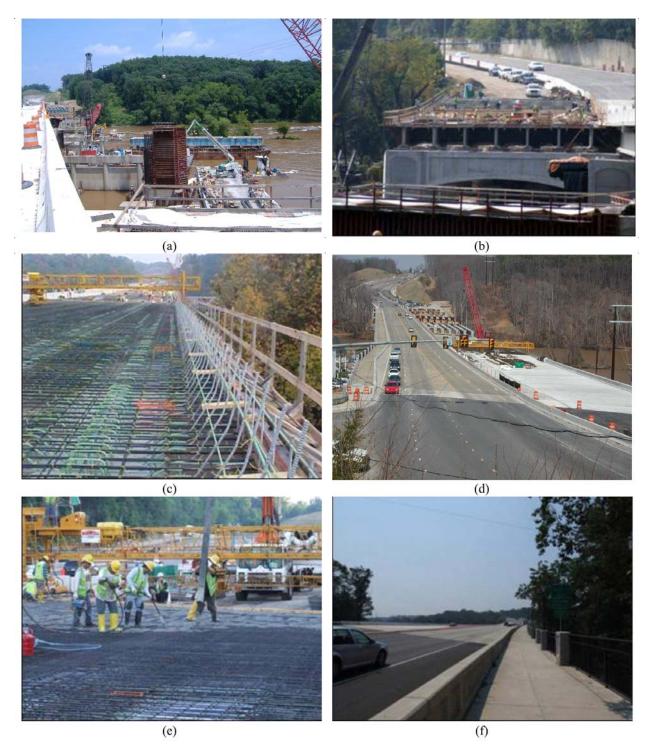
Construction of Northbound (MMFX 2) Deck. (a) Removal of old bridge and construction of new substructure, (b) Southern end of northbound lane, (c) ECR and MMFX 2 in deck with ECR and galvanized bars in parapet on Span A), (d) Construction continues to move from completed Span A deck toward Span G, (e) Placement of concrete on Span G, (f) Traffic moving freely across new structure.
